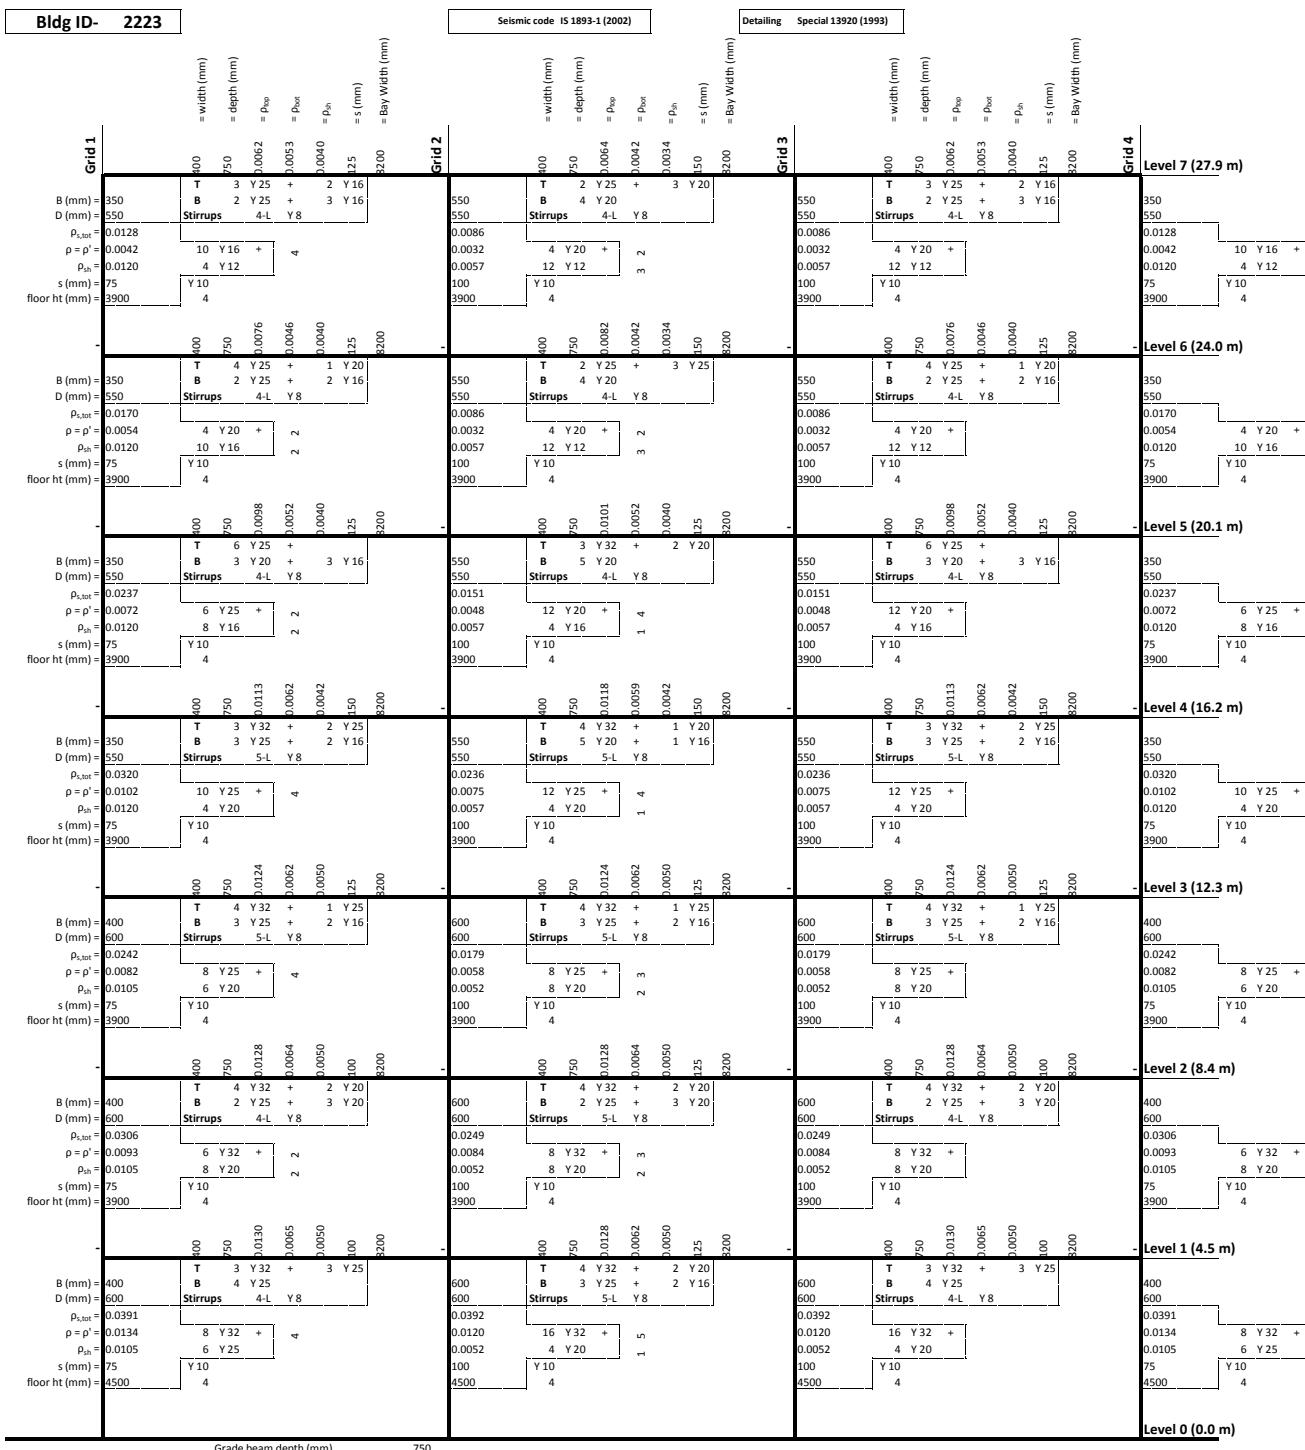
Provided reinforcement and modeling details for building ID 2223
